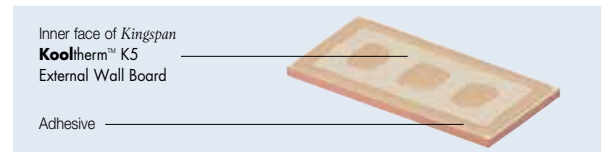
Adhesive Applied to Inner Face of Kingspan Kooltherm™ K5 External Wall Board
